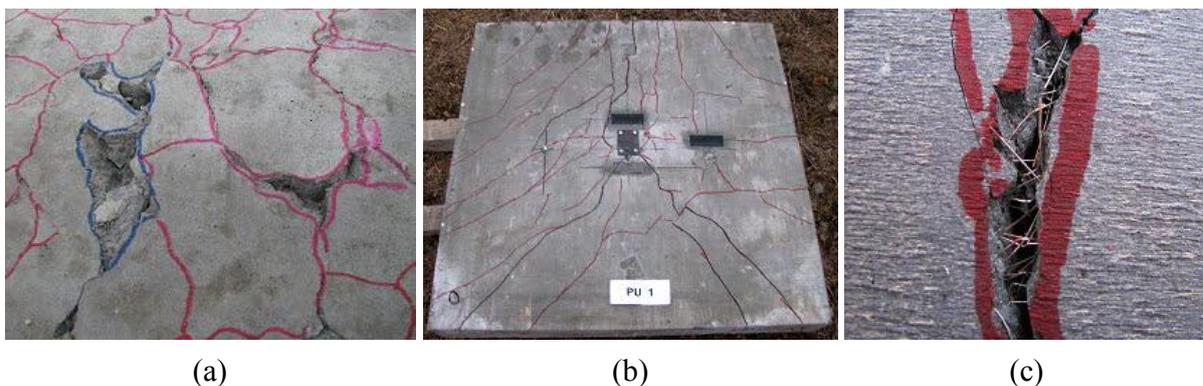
Photos of bottom surface of the blasted specimens: (a) NSC, (b) UHSC, (c) RPC
